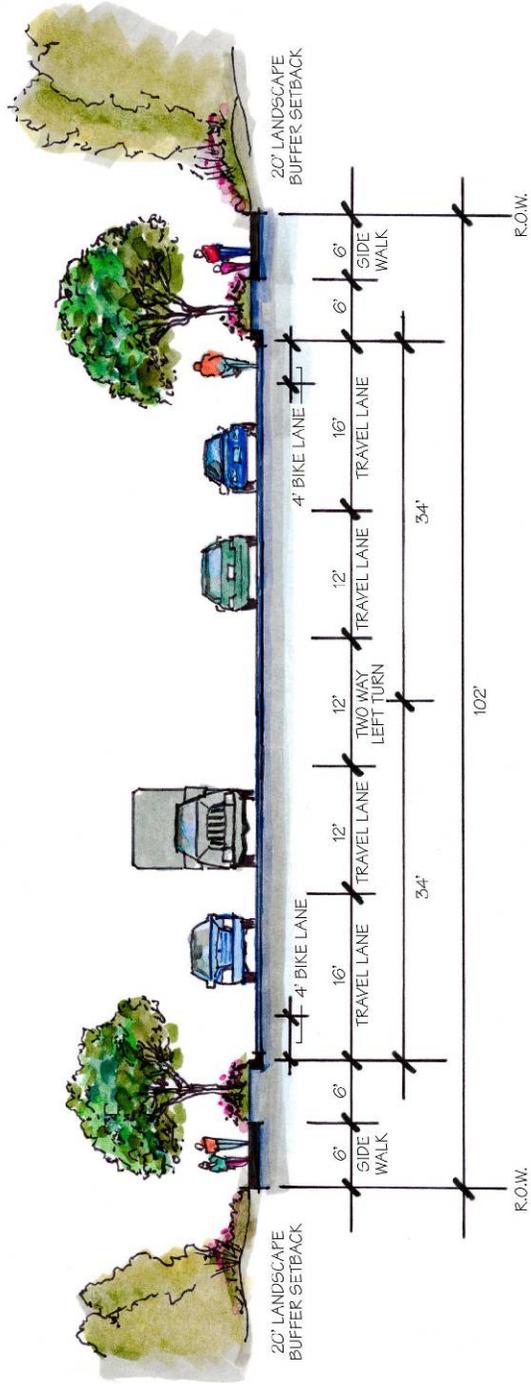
Primary Highway – 4 Lanes – Cross Section D-D (Mulberry Avenue and Slover Avenue)
